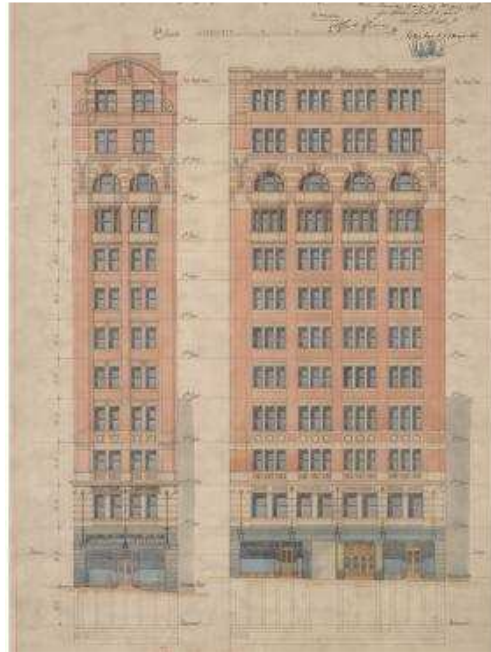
Original plan showing the King and Castlereagh Street elevations of the Culwulla Chambers building.
